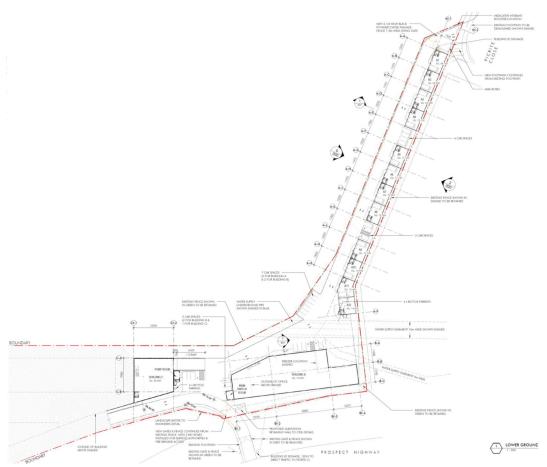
Precinct F Lower Ground Floor Plan – As Proposed (Source: Nettleton Tribe)
